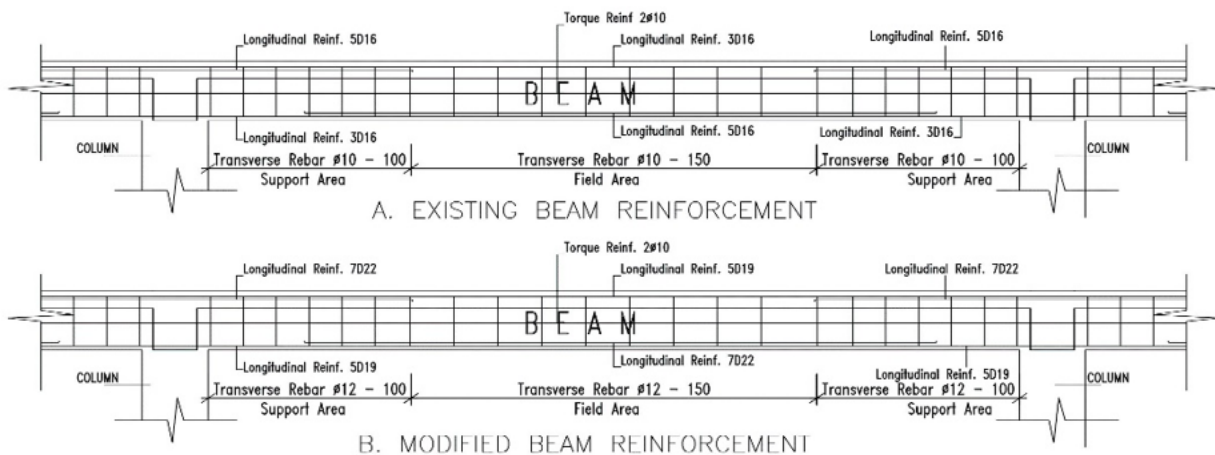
Beam longitudinal section design of reinforcement in existing condition and after modification.
